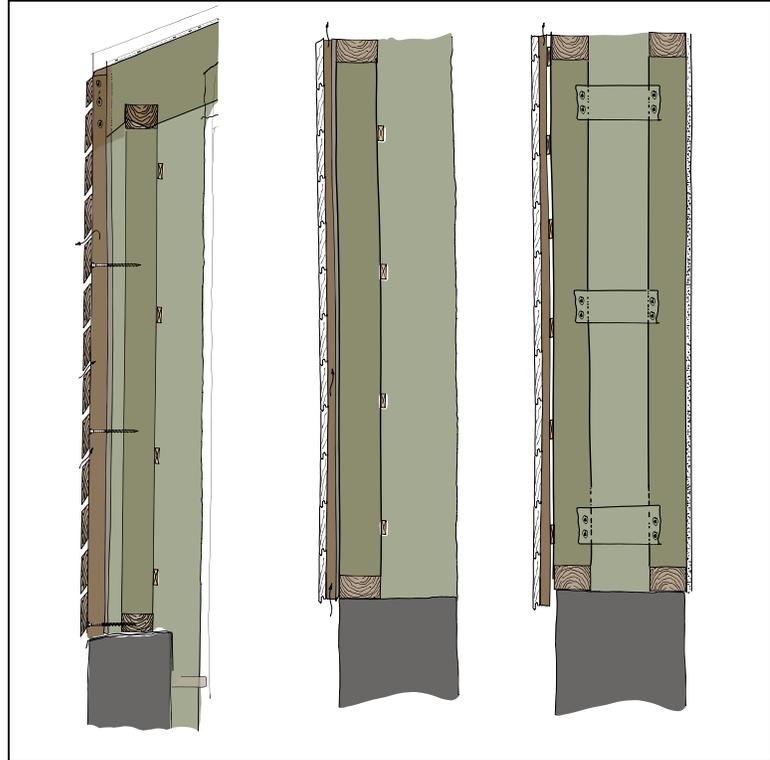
Non masonry cladding details (recreated from Stanwix and Sparrow 2014, 332)
